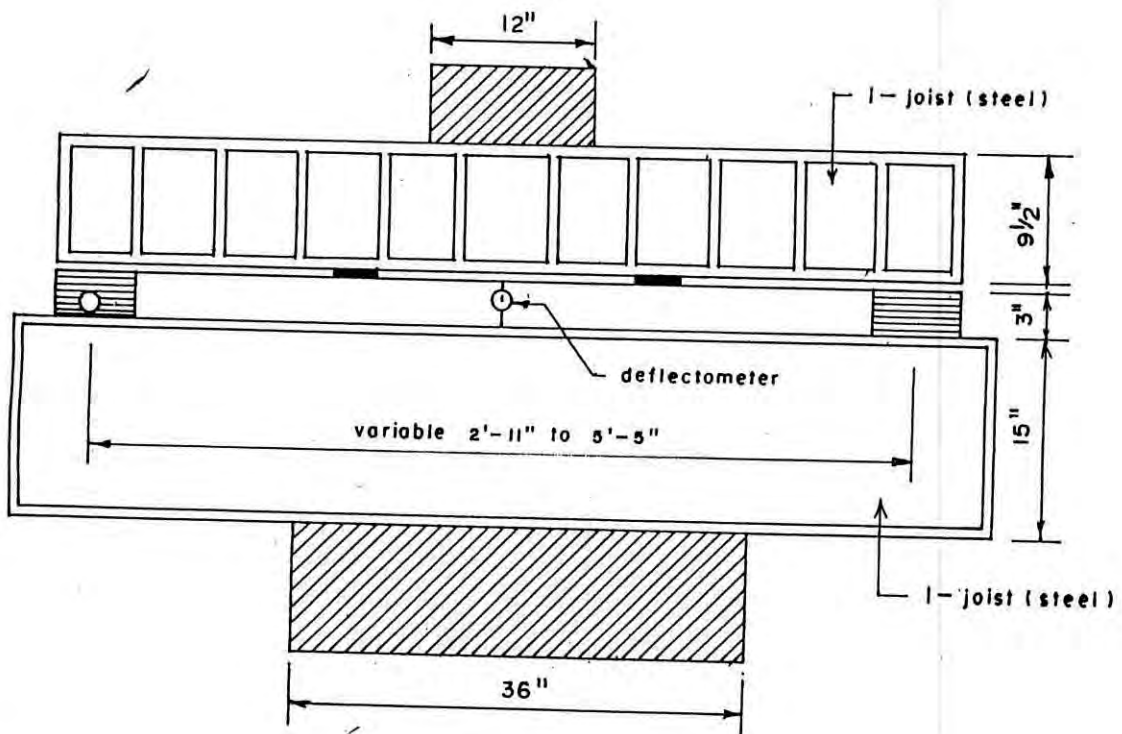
Typical Testing Arrangement for Reinforced Concrete Beam
